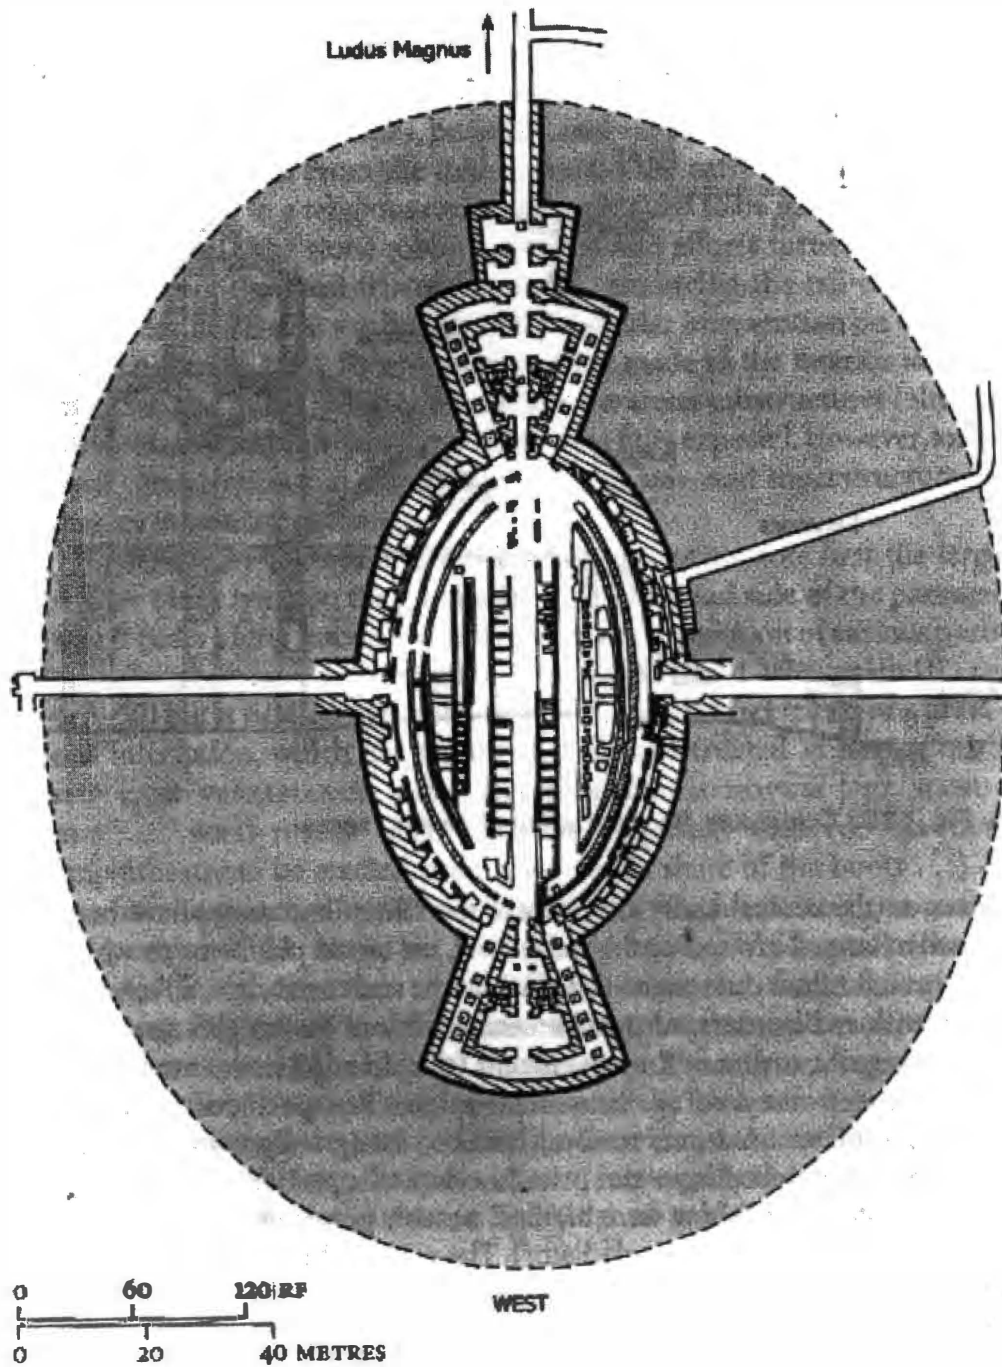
, SUBTERRANEAN PLAN OF THE COLISEUM (CLARIDGE 280)
